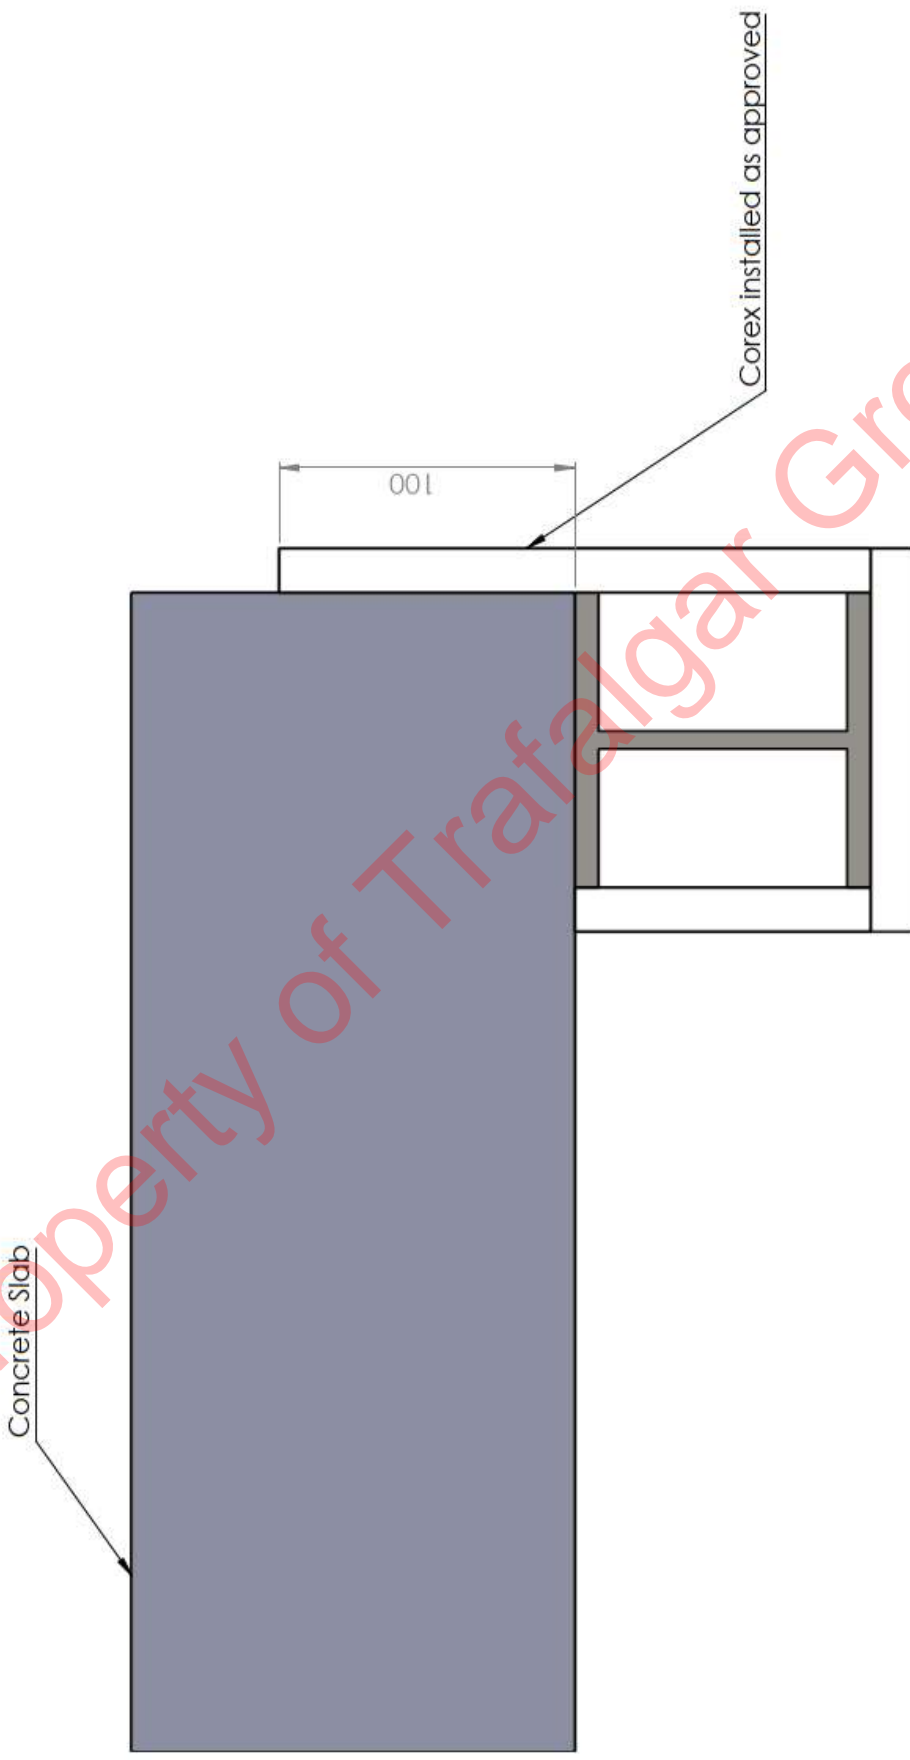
The construction detail when a steel beam is located at the edge of a slab and is protected with A1 Corex boards
